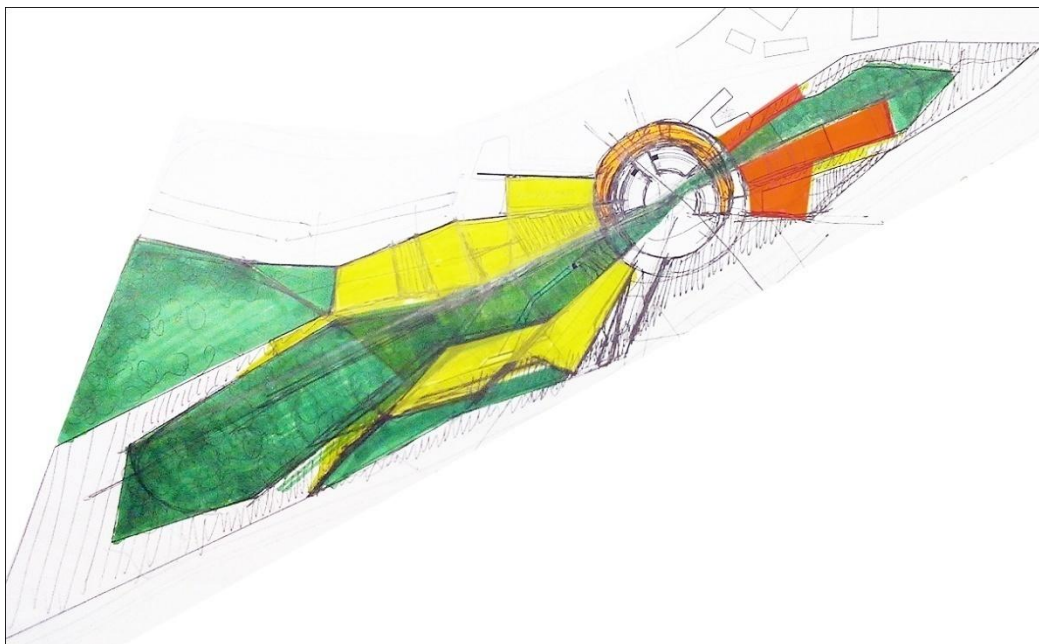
Final plan on sketch with zoning (Source:Author)
